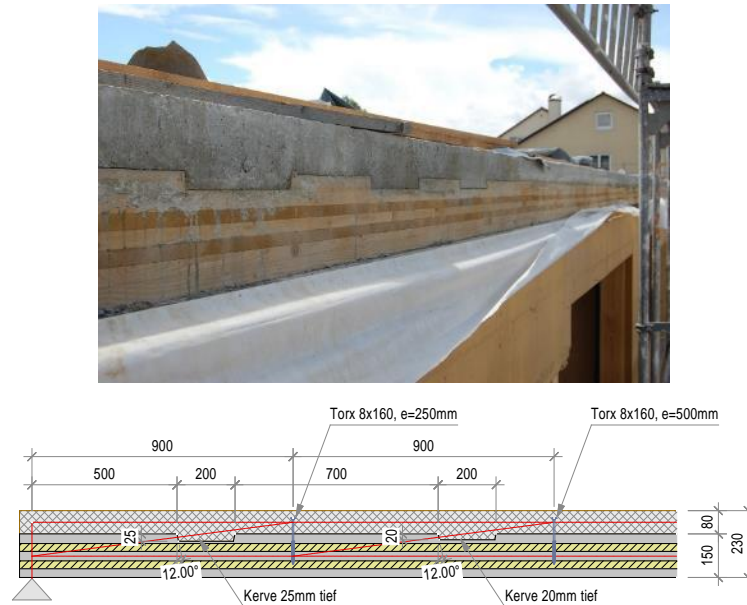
Example of a notched timber concrete composite CLT floor.
